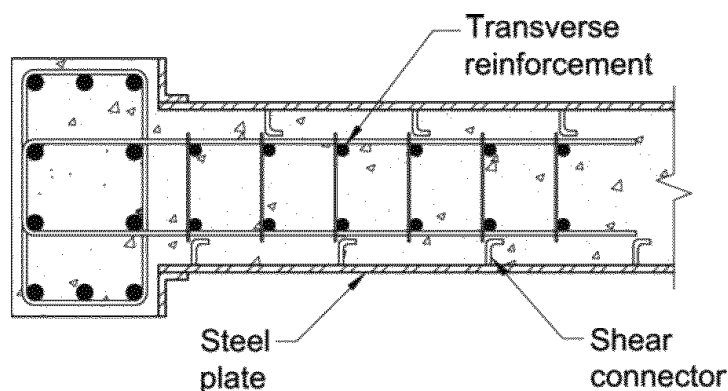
Concrete filled C-PSW with a boundary element and transverse reinforcement.
